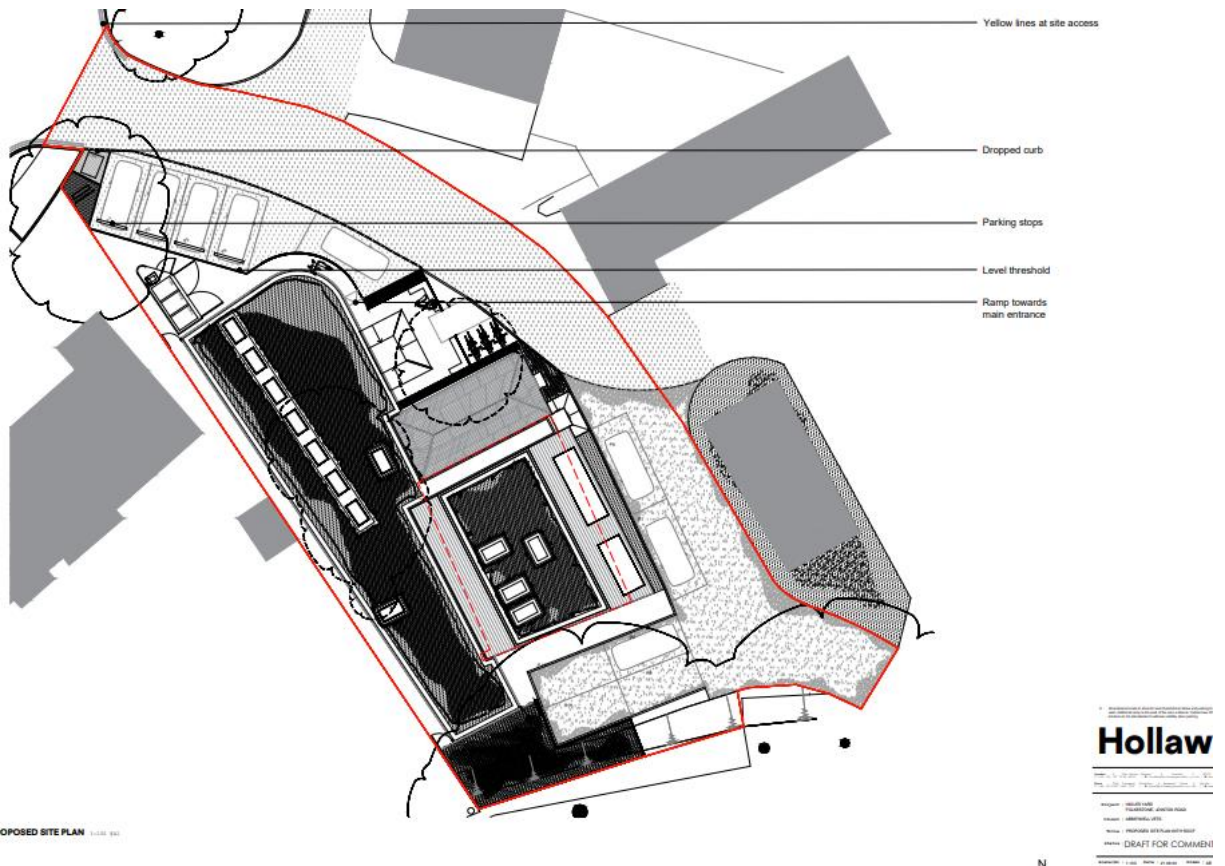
showing a block plan of the application site in red with the access at Jointon Road To the north. This shows the parking provision layout and the roof of the proposed building.
